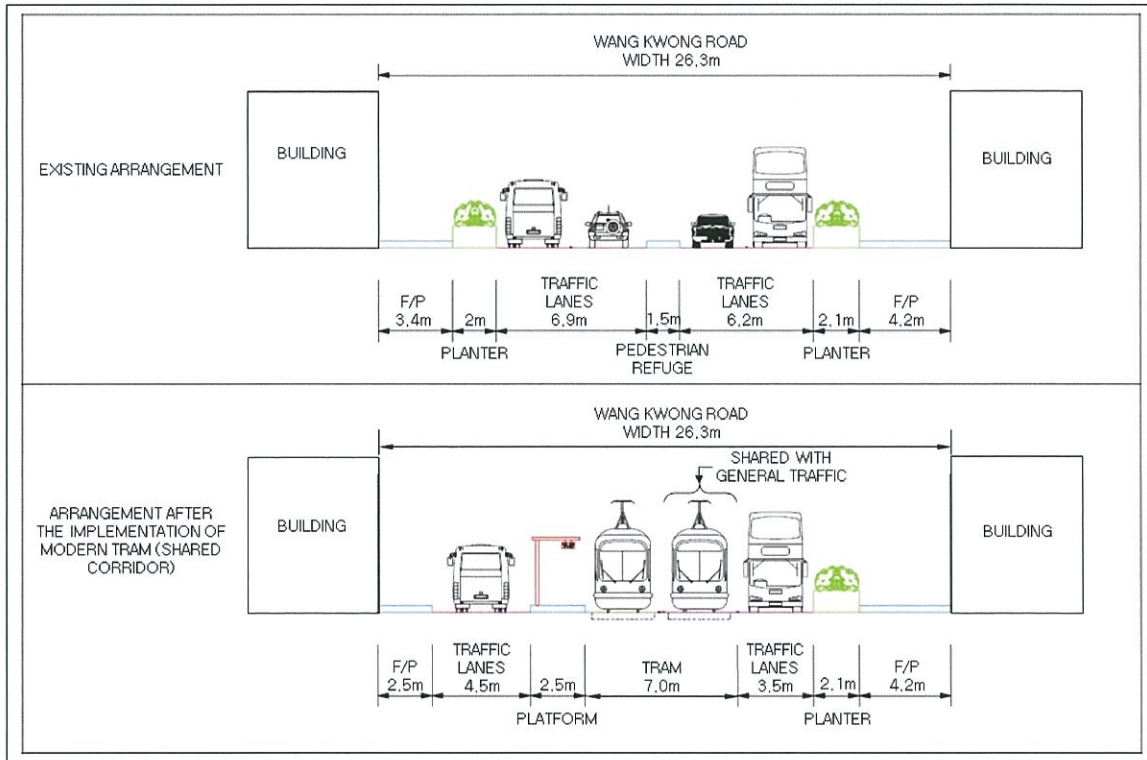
Typical Cross Section Plan of Option 2 (At-Grade Shared Corridor) on Wang Kwong Road (Before and After Implementation)
